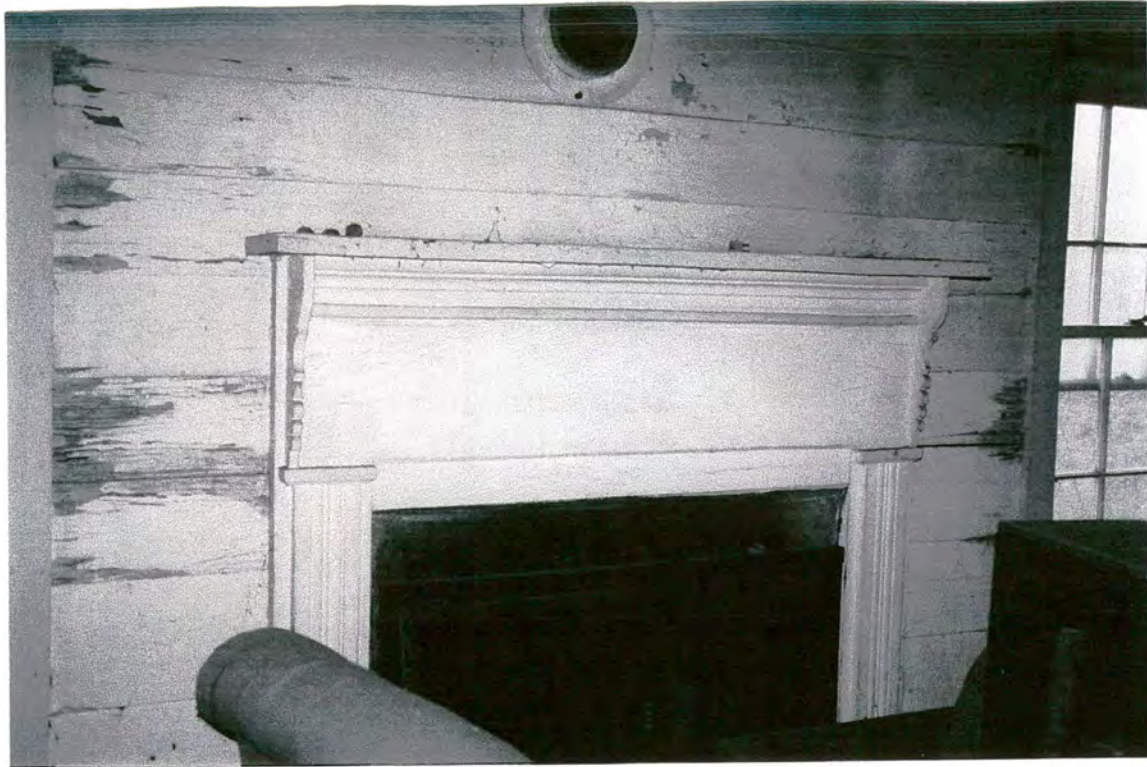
Pritchard House – mantel and north wall of hall, looking northeast
